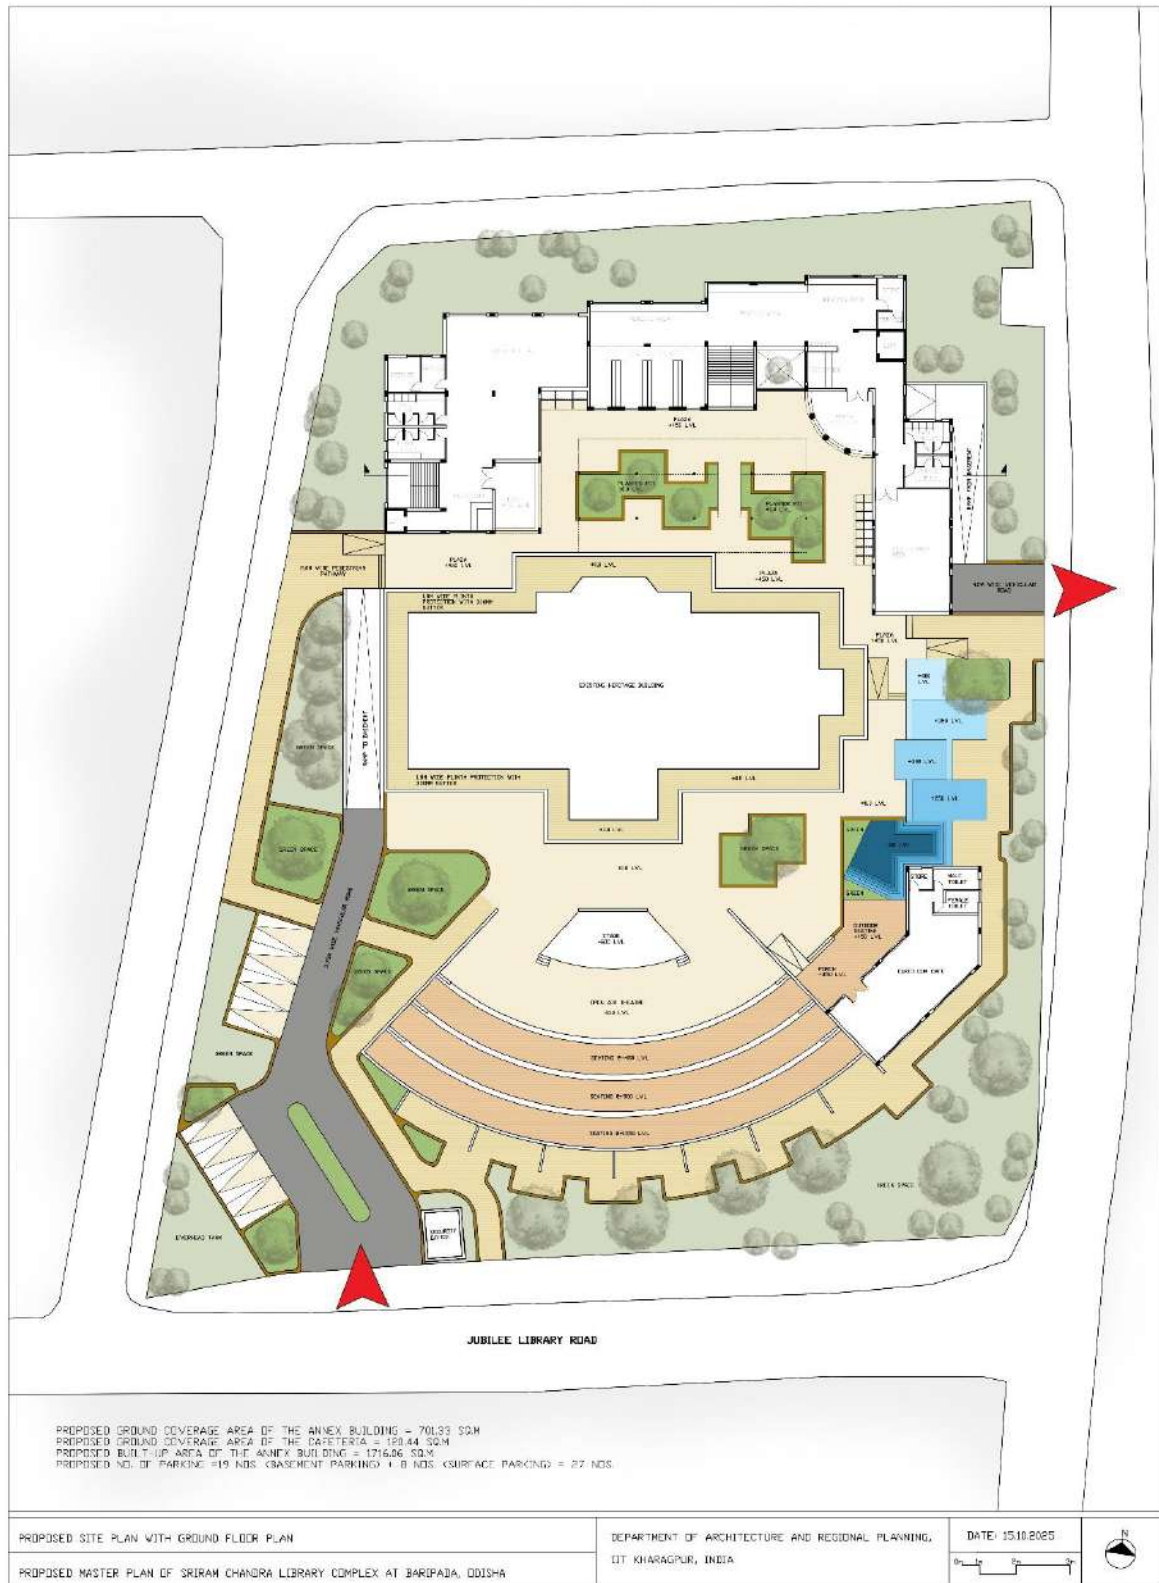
Proposed Master Plan of the Sriram Chandra Library Complex
